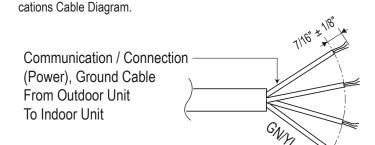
Single Zone Outdoor Unit to Indoor Unit Wiring and Communi-
